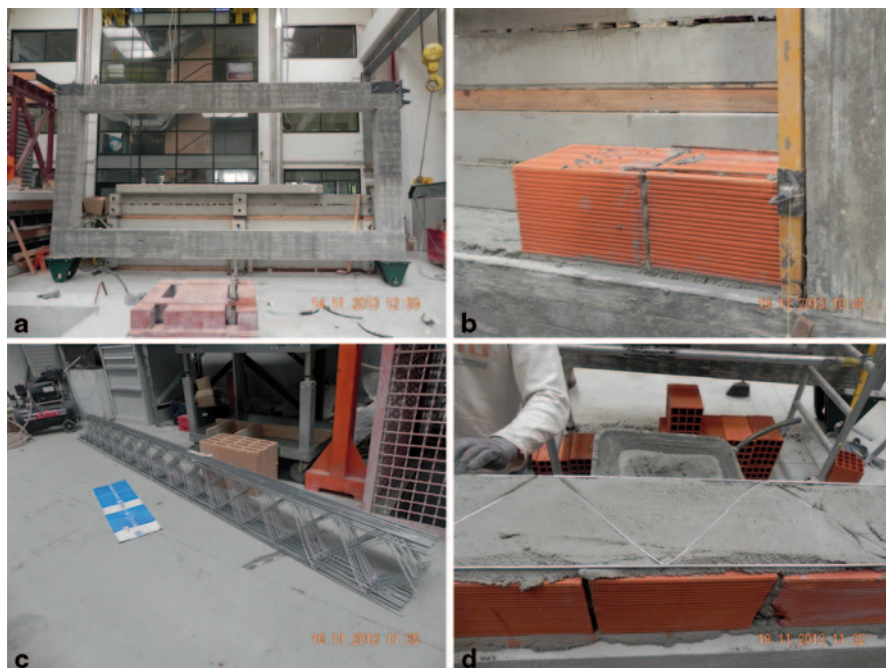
Masonry infill construction with bed joint reinforcement
